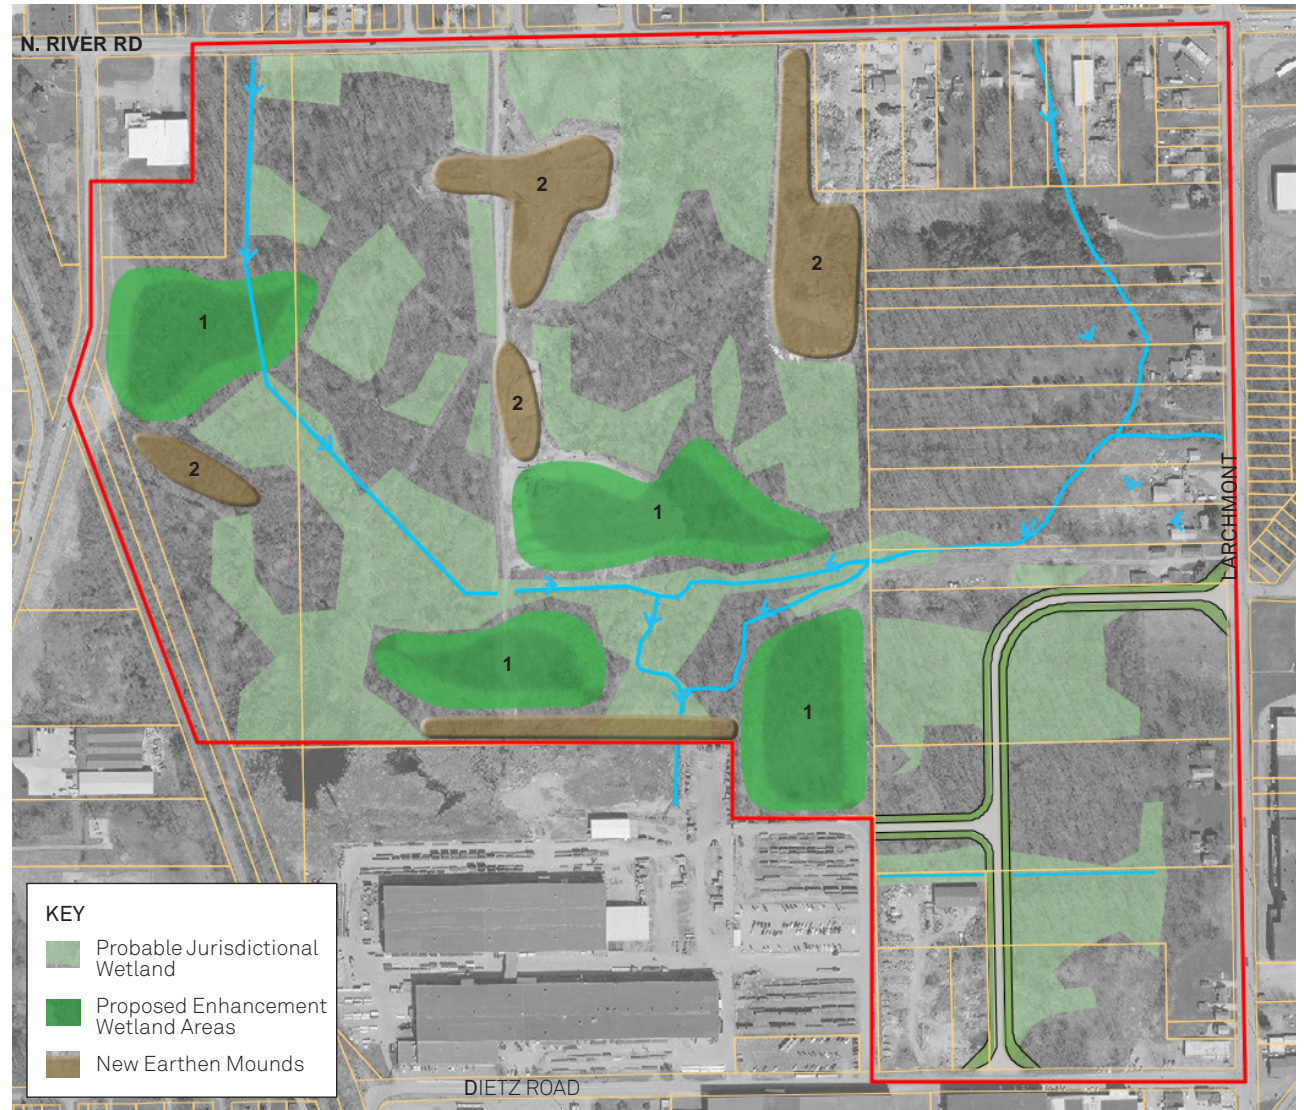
Conceptual Design for Stormwater Management and Wetland Enhancement Improvement
